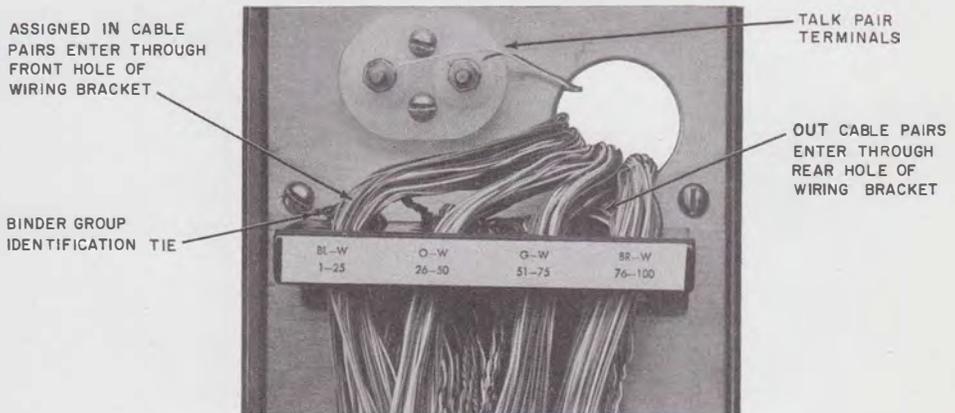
Assigned *IN* Cable Pair Routed Through Front Holes of Wiring Bracket
